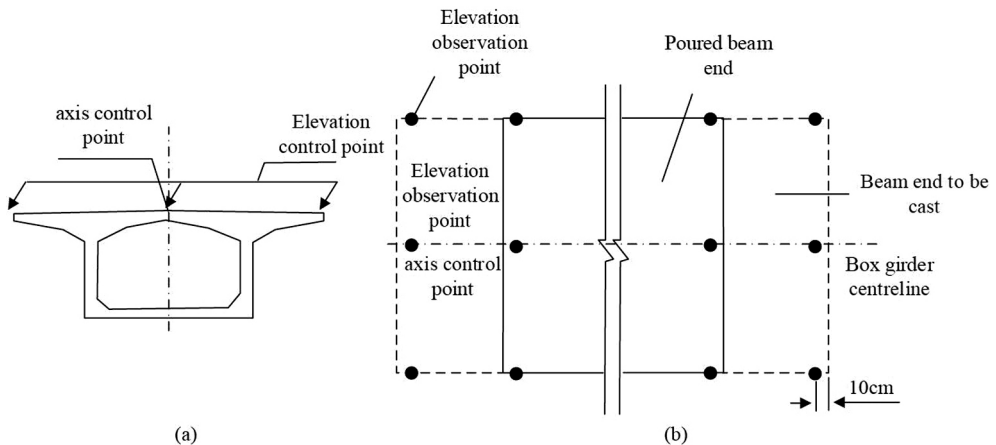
Location of observation points: (a) Cross-sectional maps, (b) Floor plan
